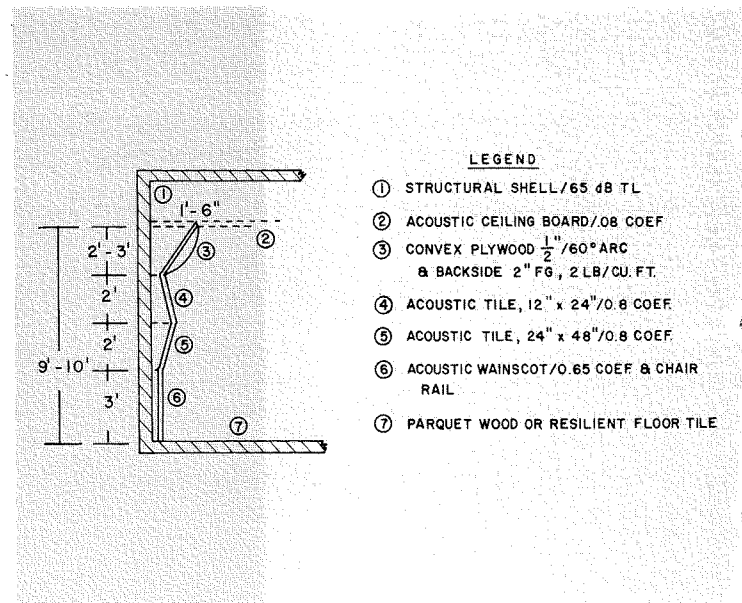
Interior outline of the wall sections for control rooms and tape mastering rooms.
